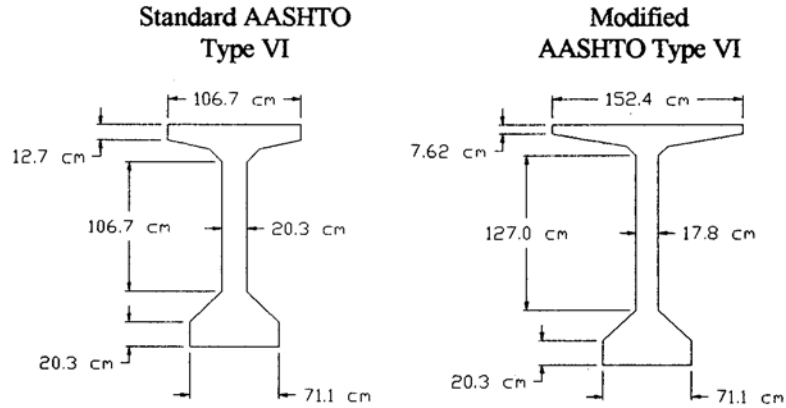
Standard and Modified AASHTO Type VI Girder Cross-sections.
